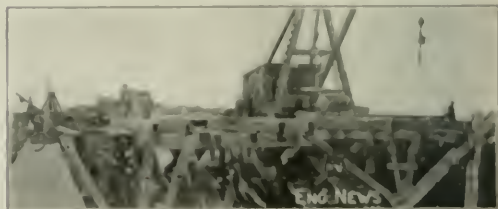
TRAVELING DERRICK SETTING FALSEWORK ON VIADUCT
